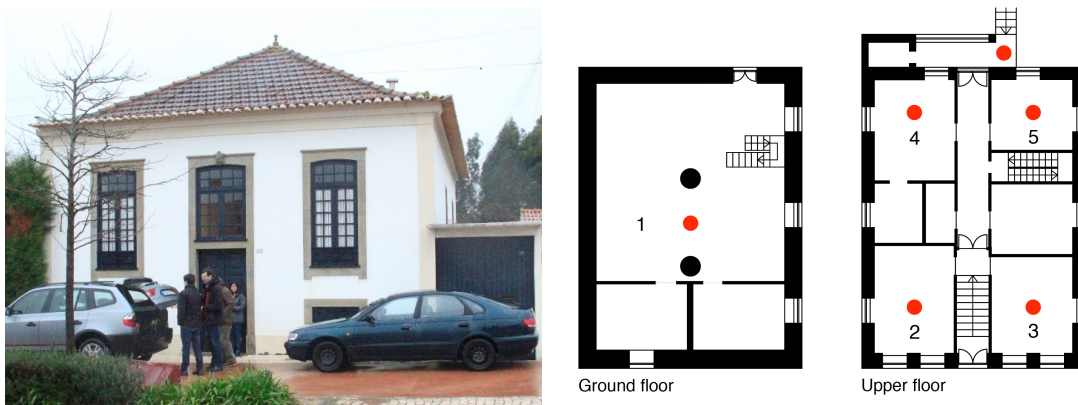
(left) External view; (right) Floor plans showing the position of measuring instruments (1—living room; 2—bedroom 2; 3—bedroom1; 4—kitchen; 5—bedroom3).
